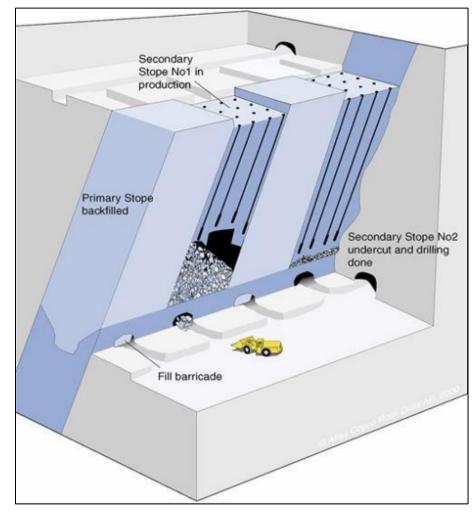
Typical long-hole open stoping (LHOS) arrangement
